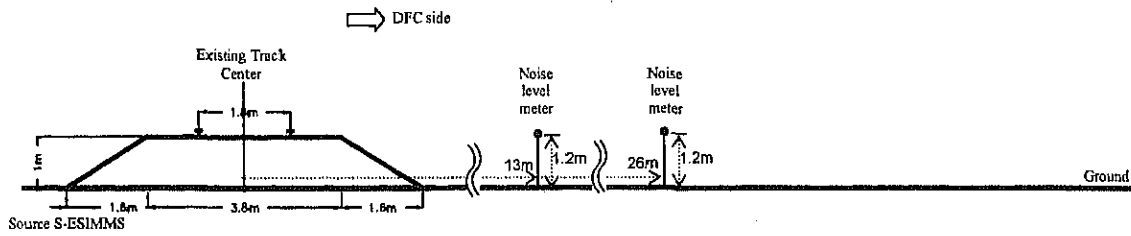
Cross-section view of AB-1 Measurement Site in Abu Road
